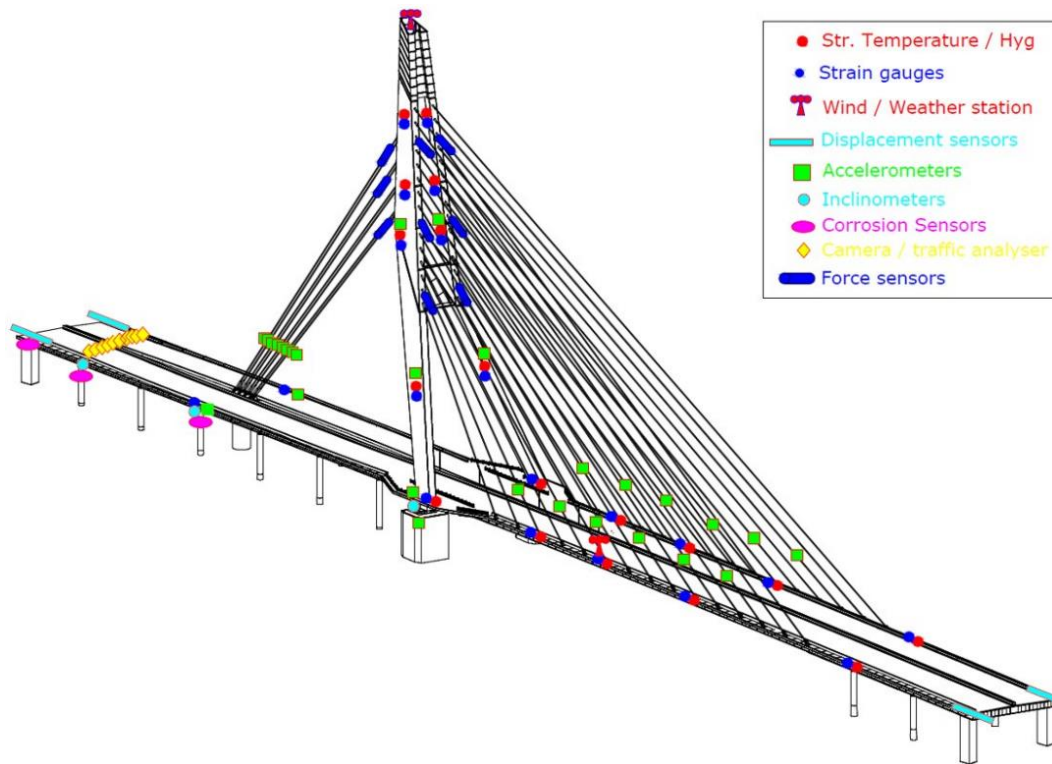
Layout of sensors on the Wazirabad Bridge, as designed.
